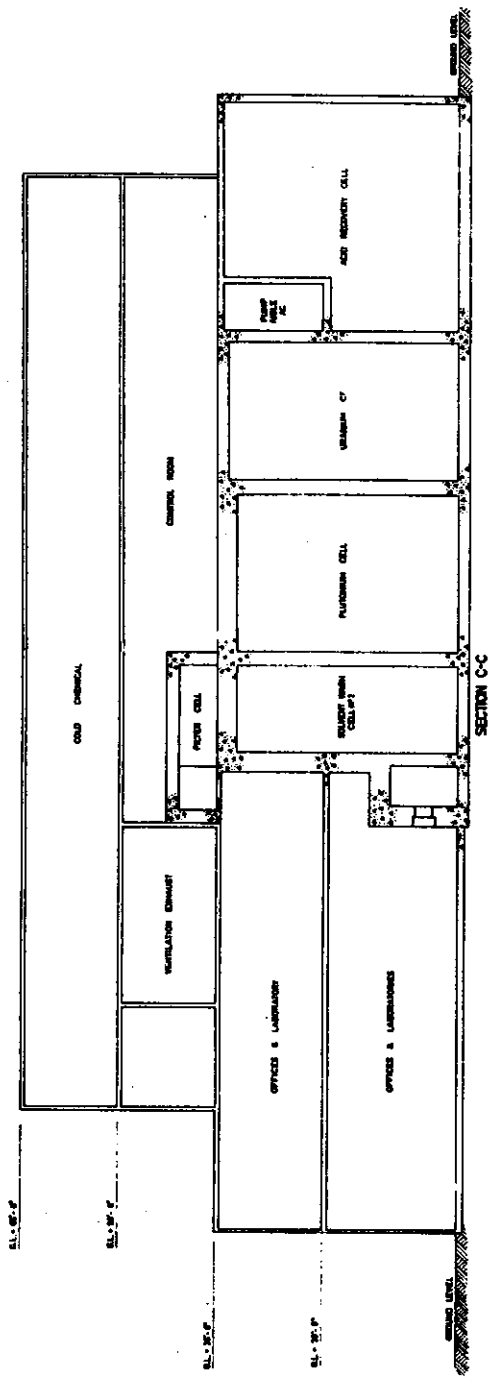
BUILDING DESIGN - BUILDING SECTIONS
